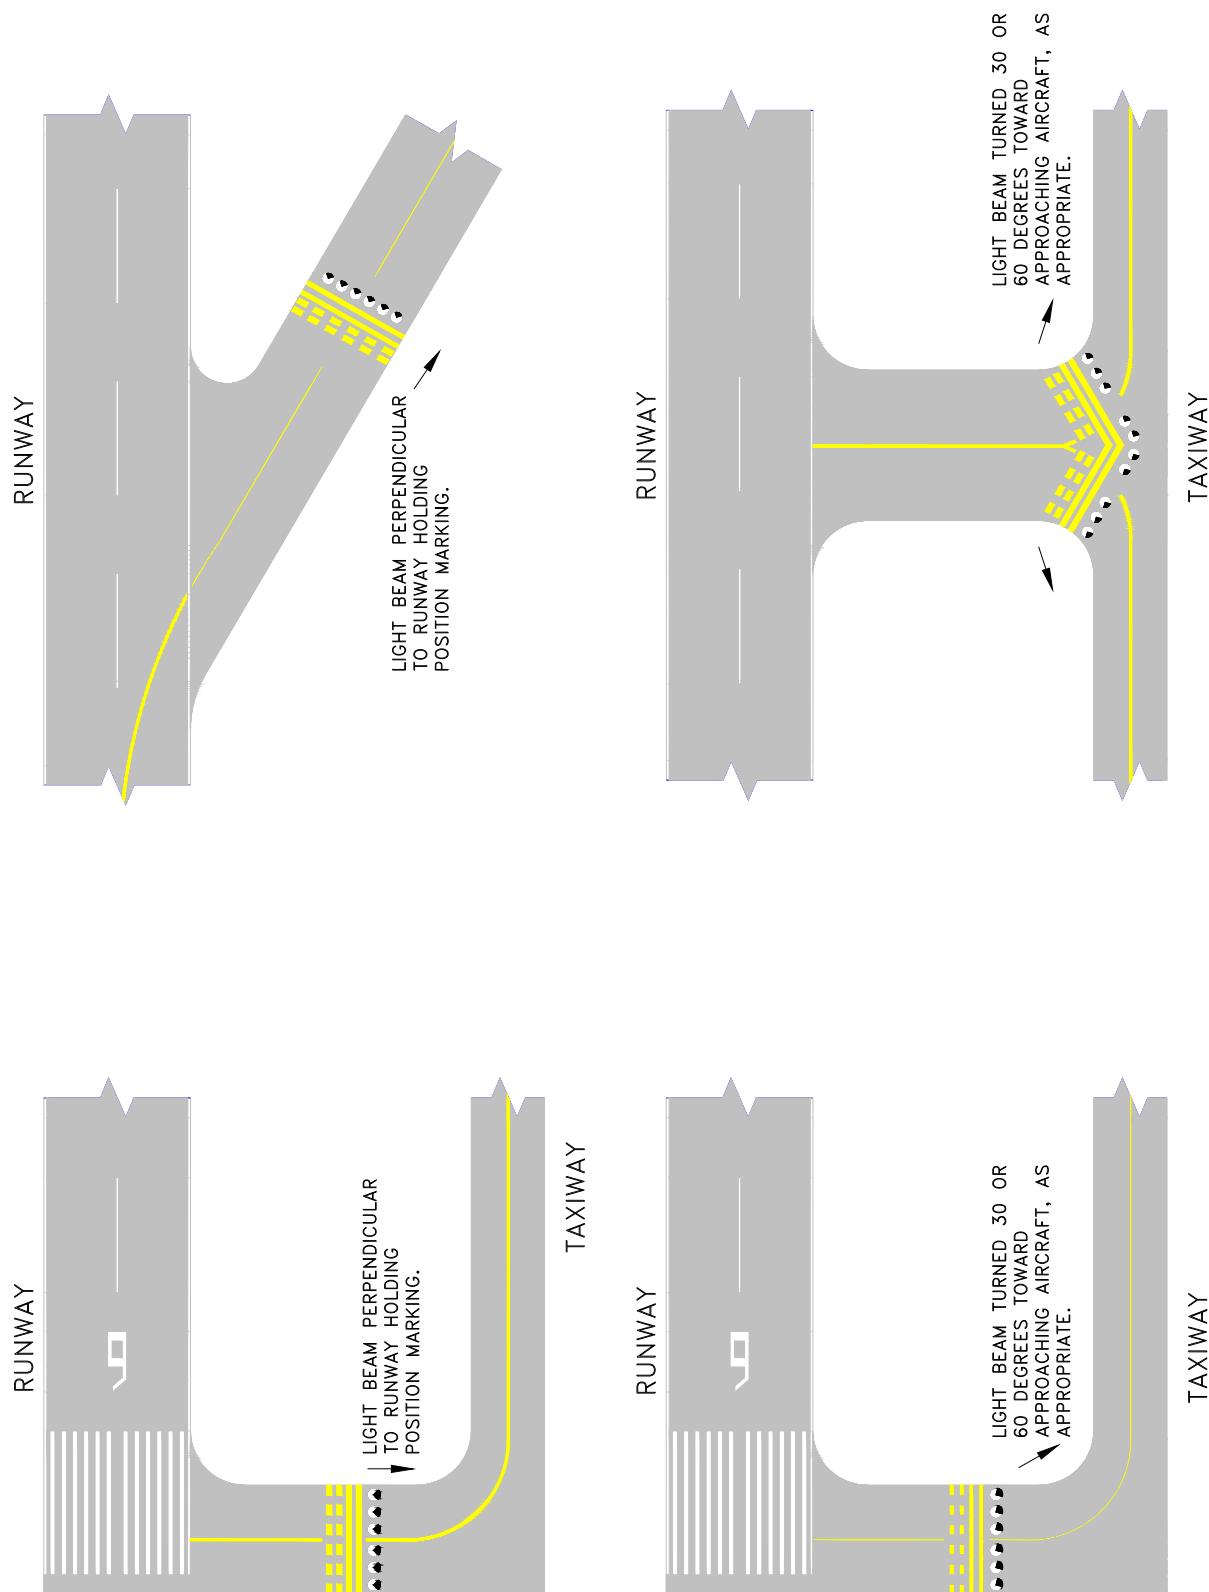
Typical Light Beam Orientation for In-Pavement RGLs and Stop Bars.
